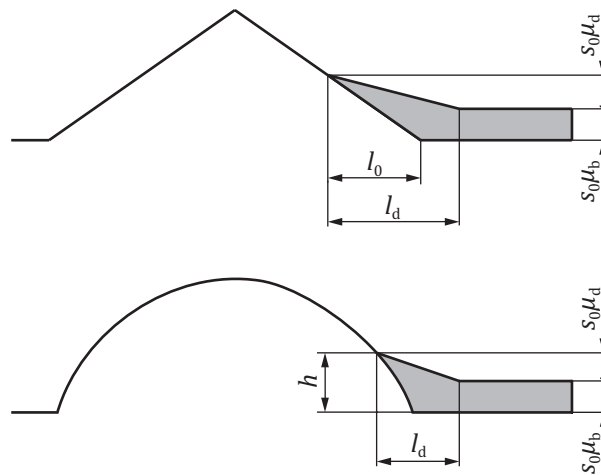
Additional drift load and sliding load acting on upper arch or pitched roof
